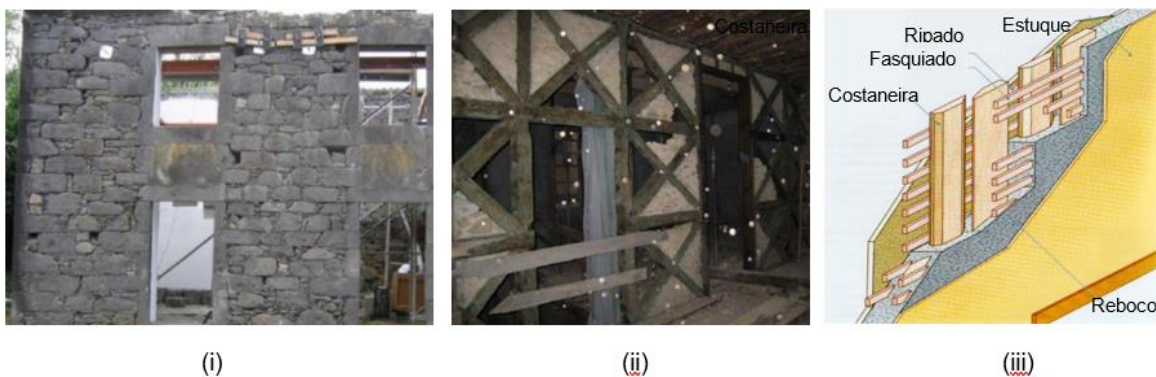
(i) stone masonry wall ; (ii) frontal wall - Cruz de Santo André detail (Appleton, 2010); (iii) board placed at the top noggin wall (Appleton, 2011).
